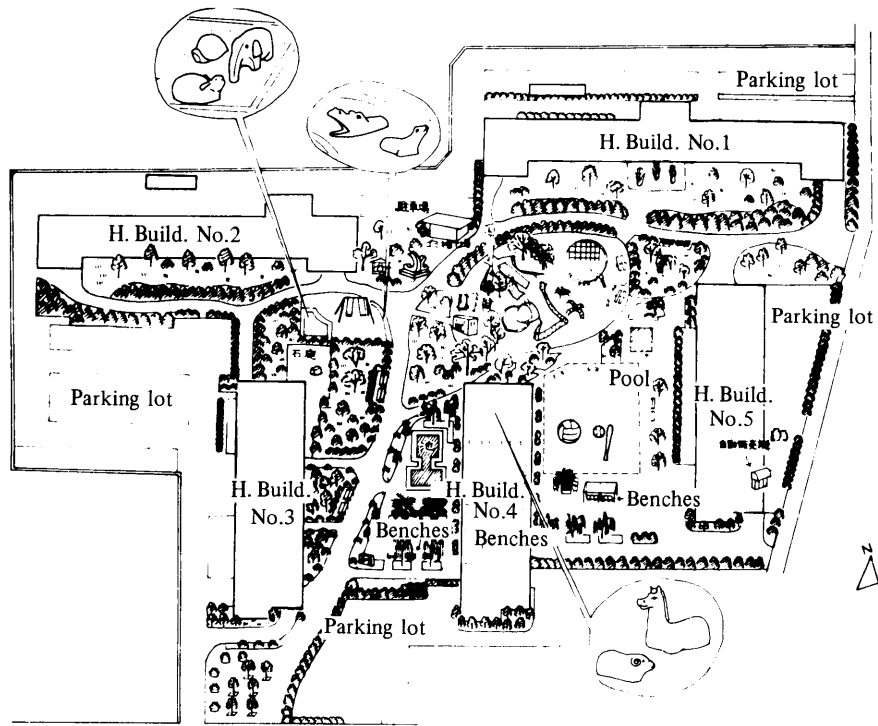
Plot plan of house building in Morinomiya Estate No. 1
